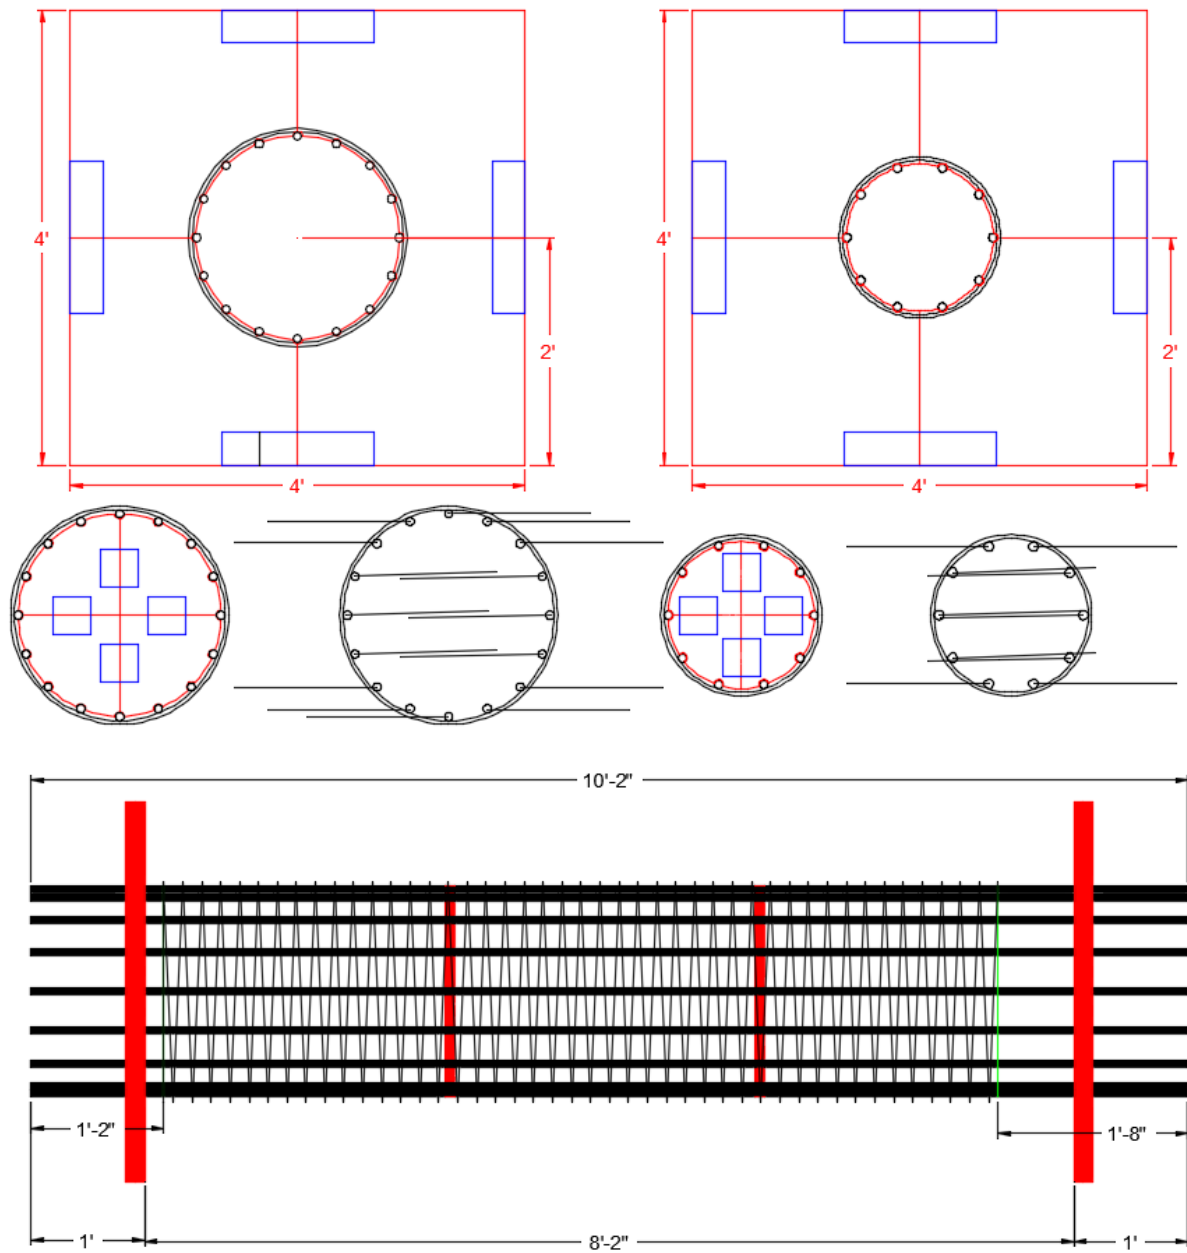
Column Reinforcing Cage Construction Method with Rebar Templates
